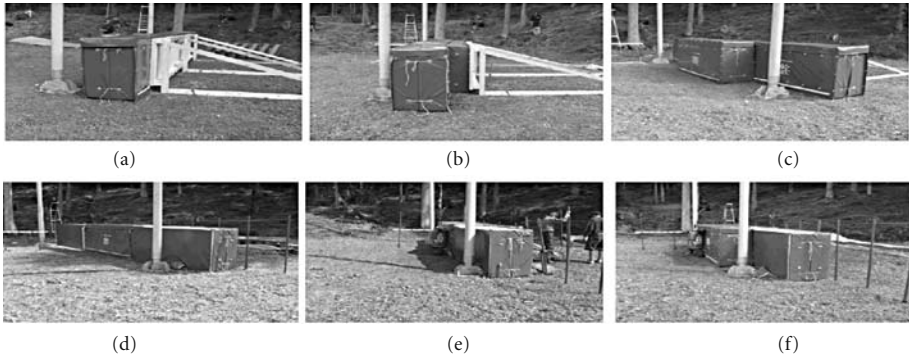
The innovative foam barrier under the testing tower. (a-b-c) Fixed wall restraint on barriers type B-1, B_1.5 and B_2 respectively. (d-e-f). Spaced PVC poles acting as a restraint on barriers type B-1, B_1.5 and B_2 respectively.
